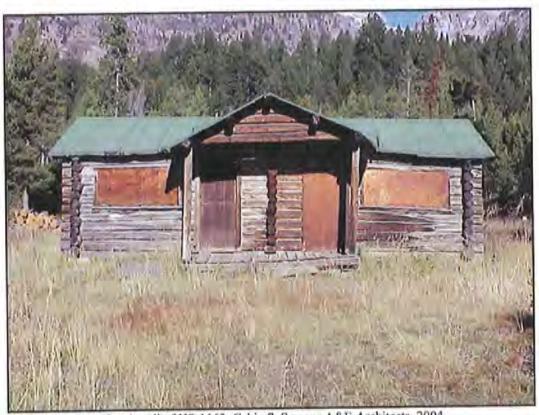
East (front) wall of HS-1163, Cabin 7. Source: A&E Architects, 2004.
